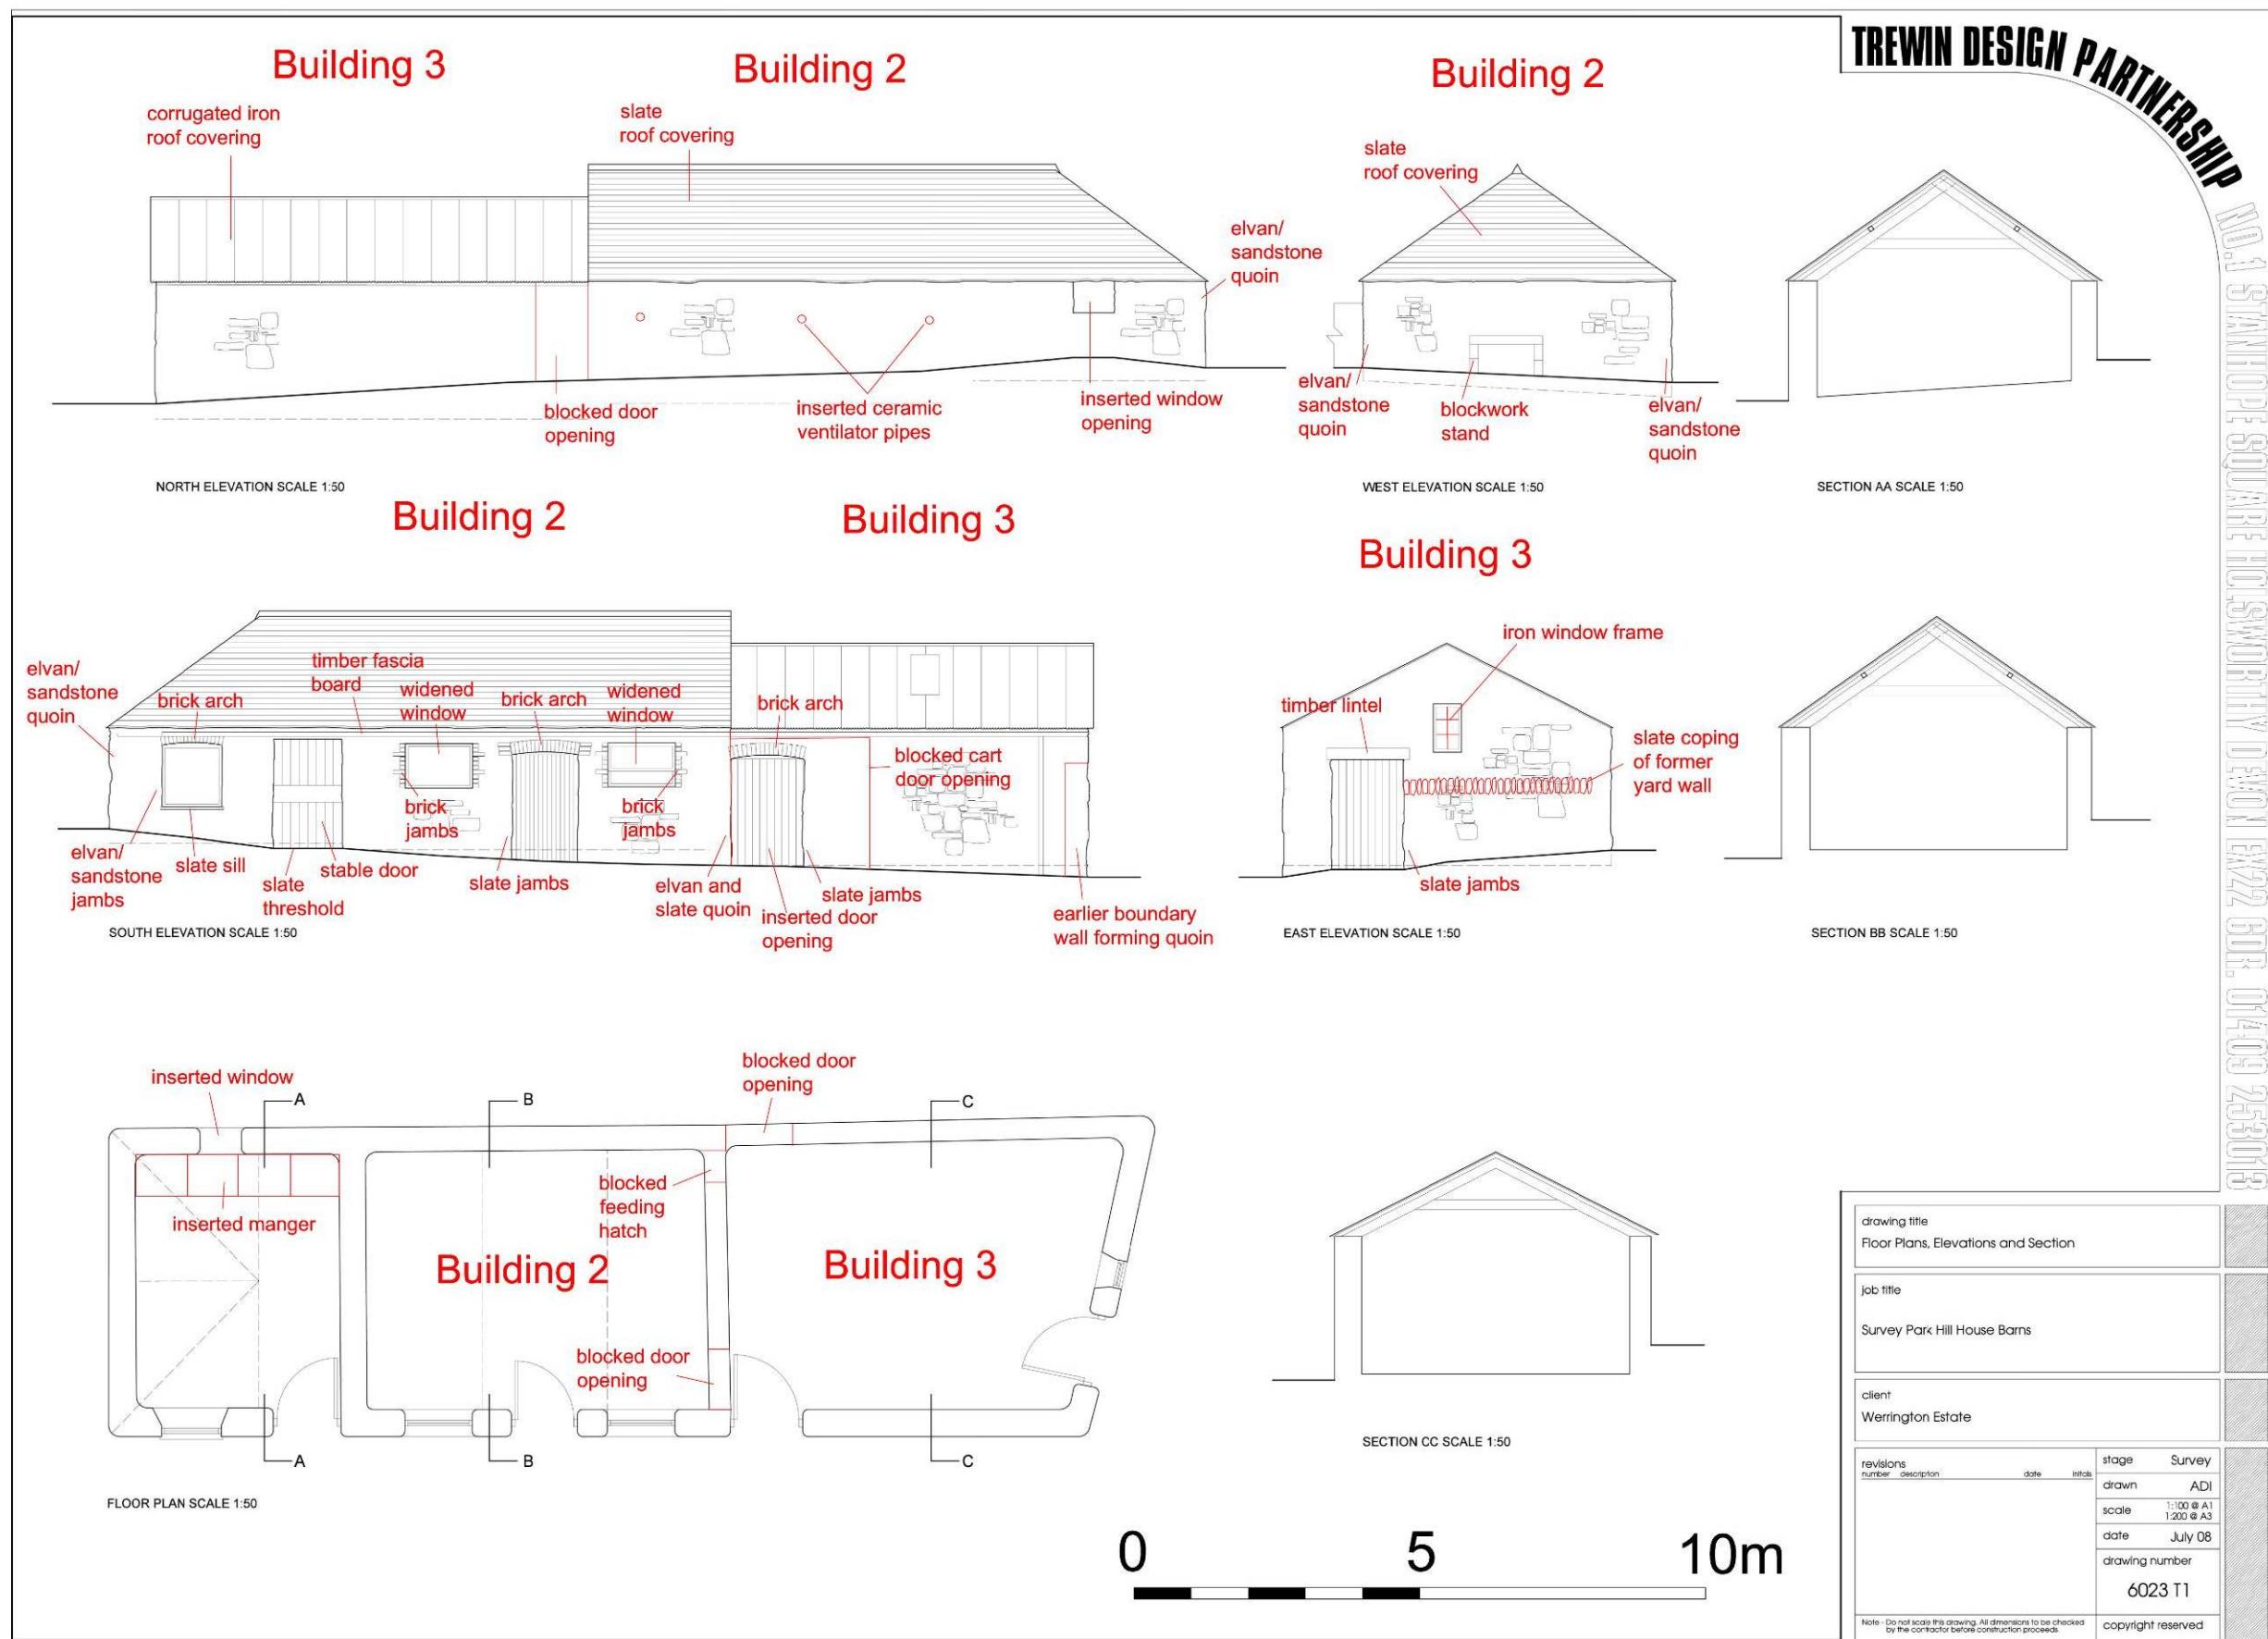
Buildings 2 and 3 annotated elevations and plan (original drawing supplied by Trewin Design Partnership)
